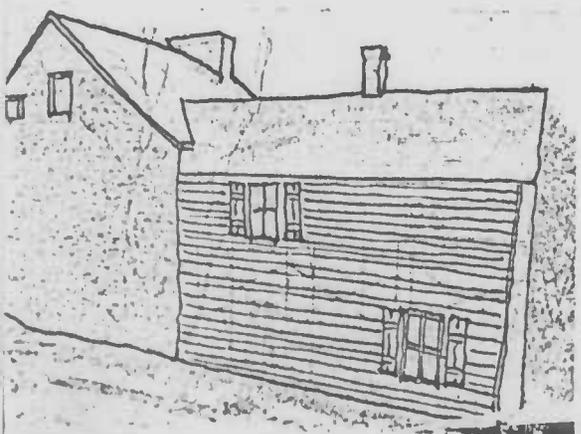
NORTH SIDE ELEV. (EXISTING)
